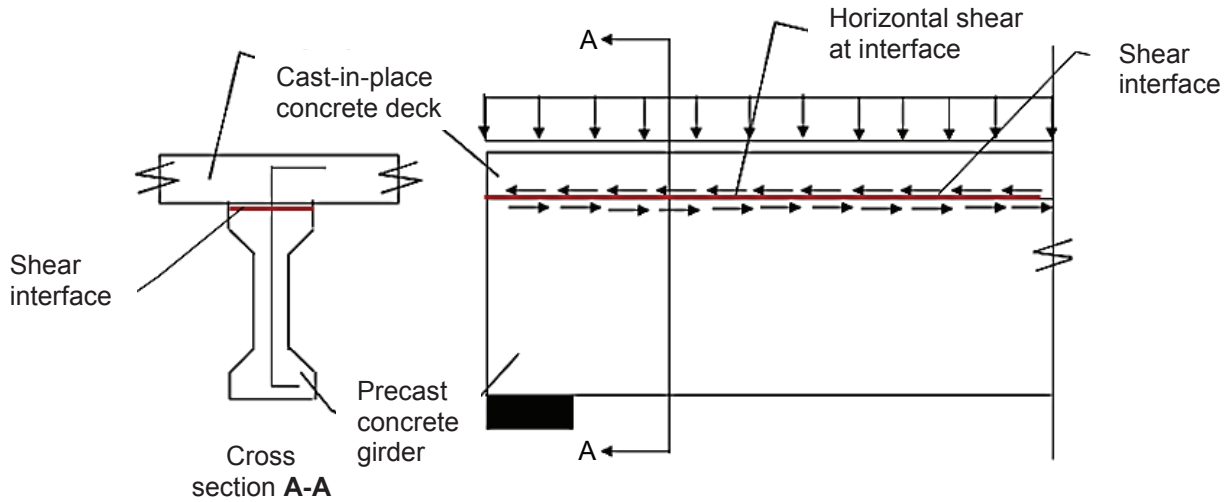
Graphic showing location of nterface shear transfer between precast concrete girder and cast-in-place concrete deck.
